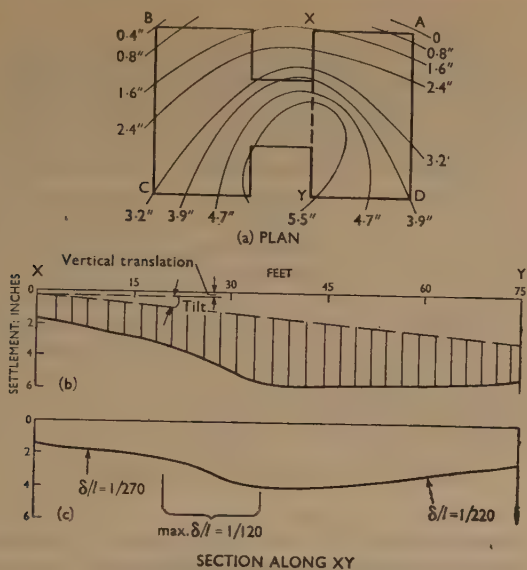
SETTLEMENTS OF BUILDING [57]
